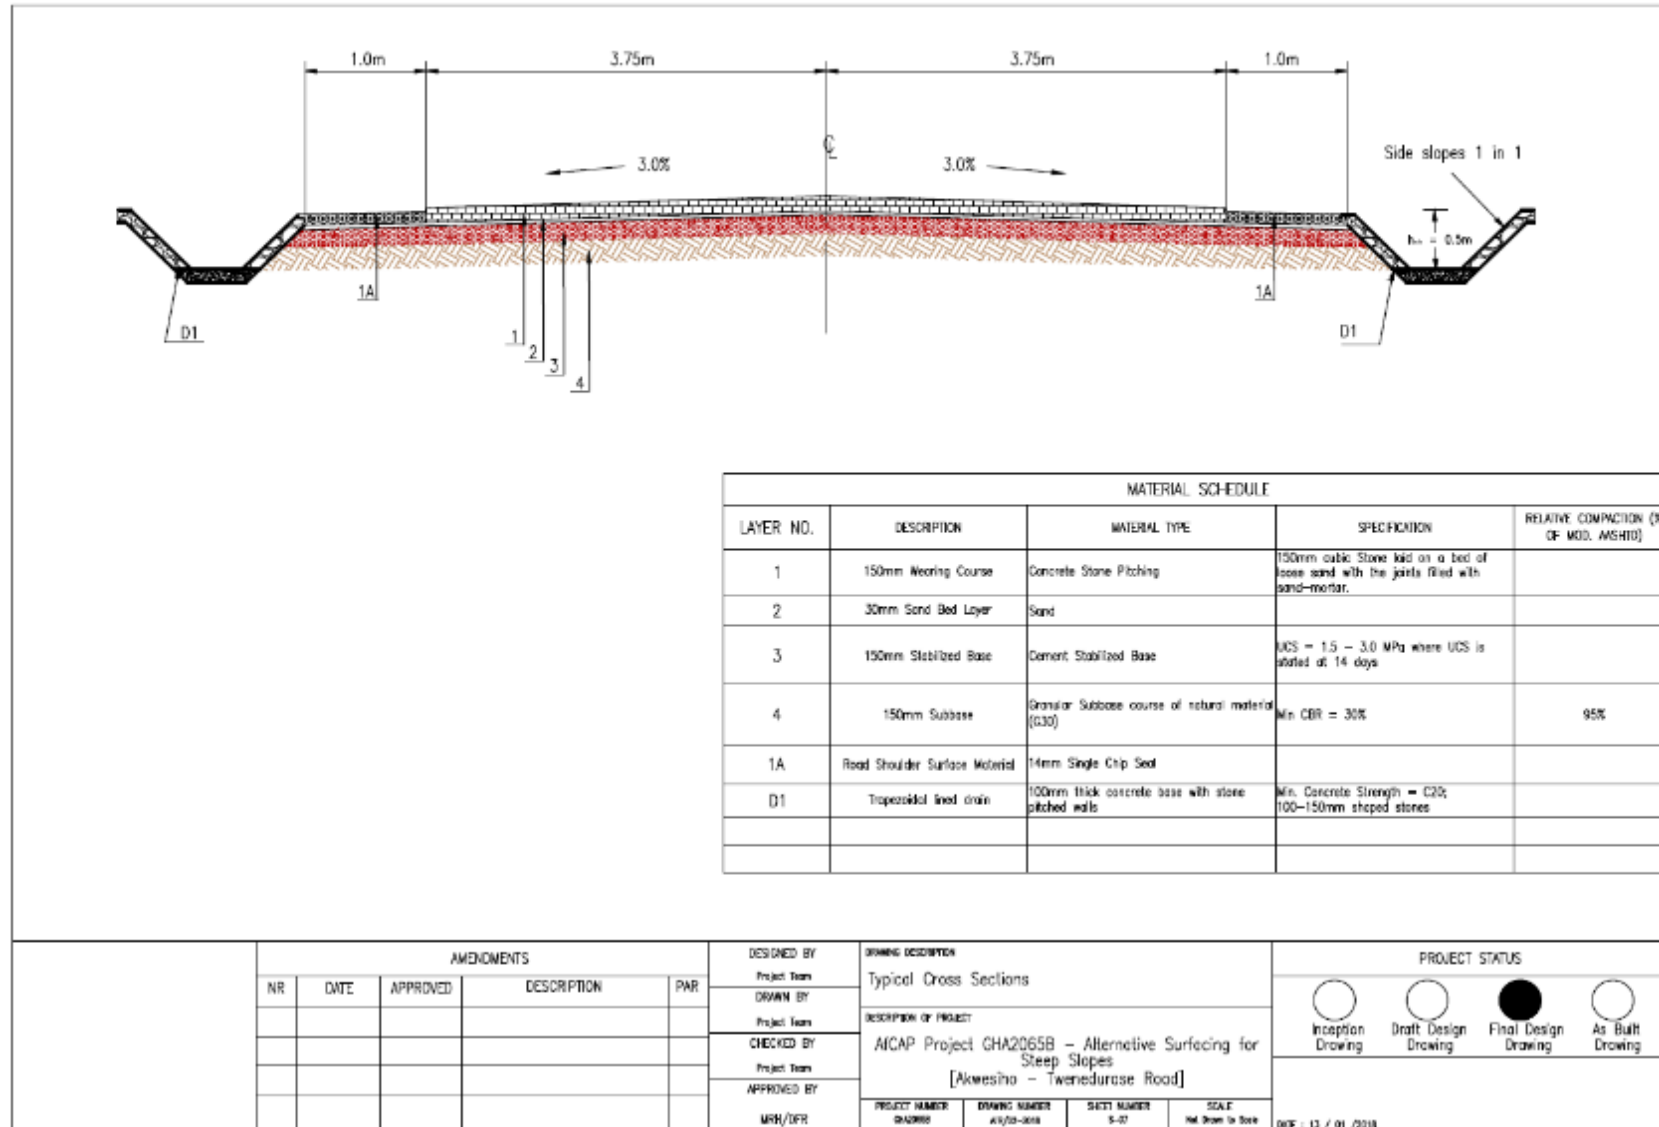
Typical cross section for HPS @ Chainage 2 + 235
